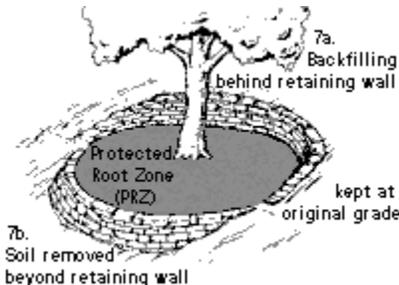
If you change the grade within the root zone, use retaining walls to keep as much of the original grade as possible.
